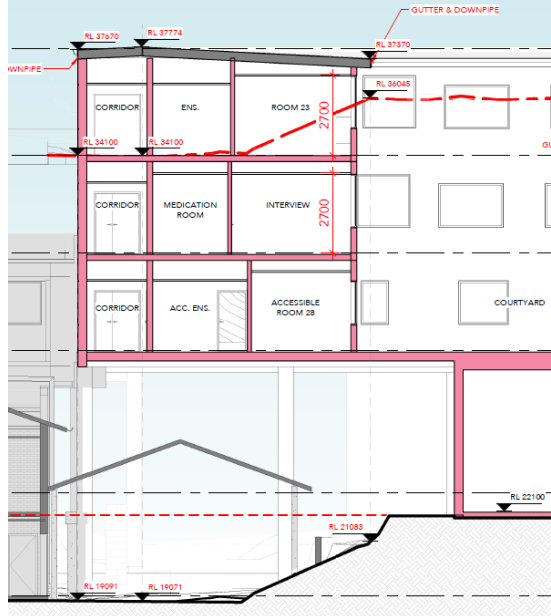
East Elevation - Lytton Street View (Team 2 Architects 2022)
